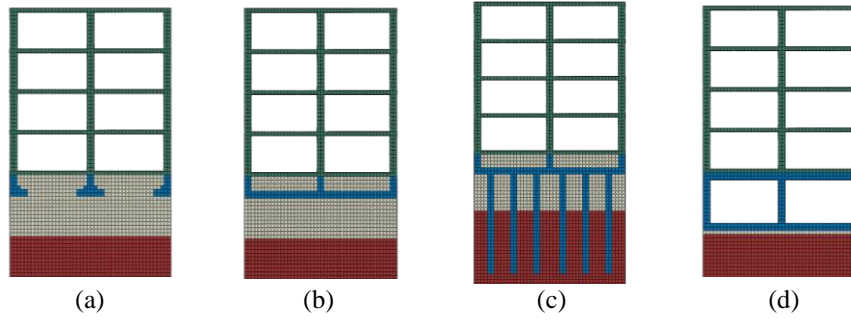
Different foundation types modelled in ABAQUS: (a) strip foundation; (b) raft foundation; (c) pile foundation and (d) box foundation.
